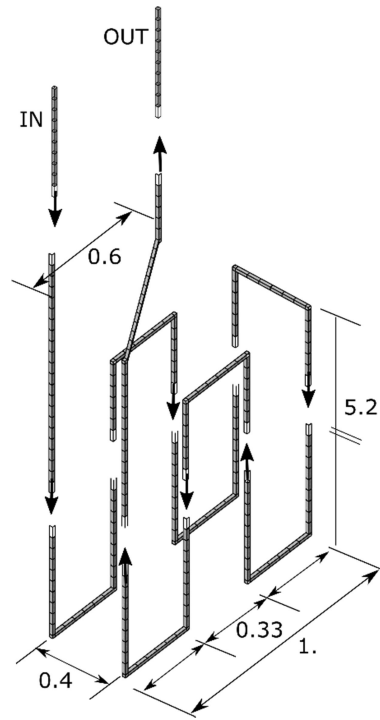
Layout of the enhanced Double-W heat exchanger pipe (units m)
